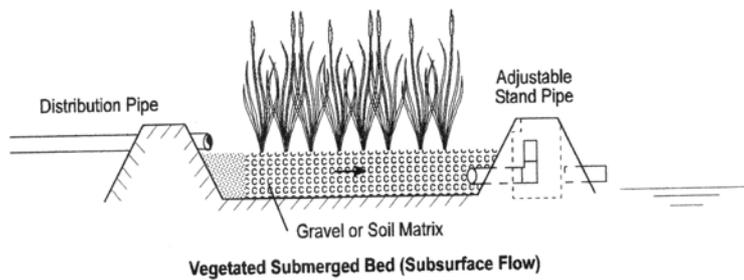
A SSF Constructed Wetland Illustrative Cross-section
